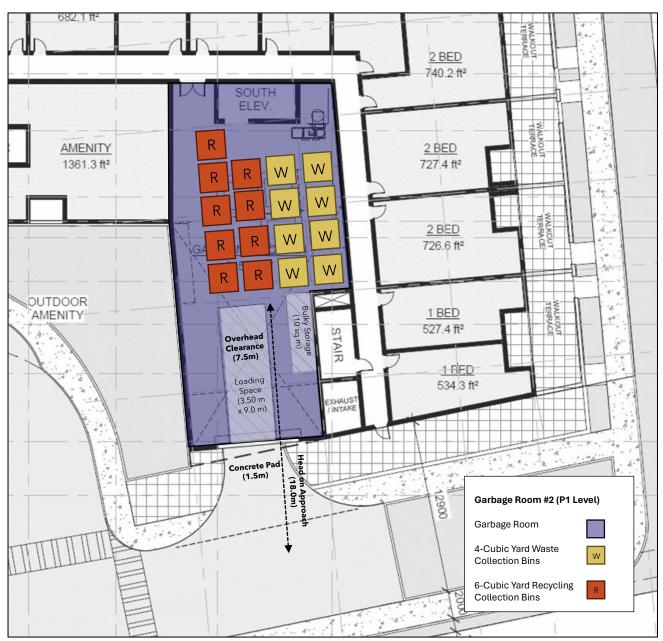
Garbage Room #2 (P1 Level) - Indoor Waste Staging and Collection Area
